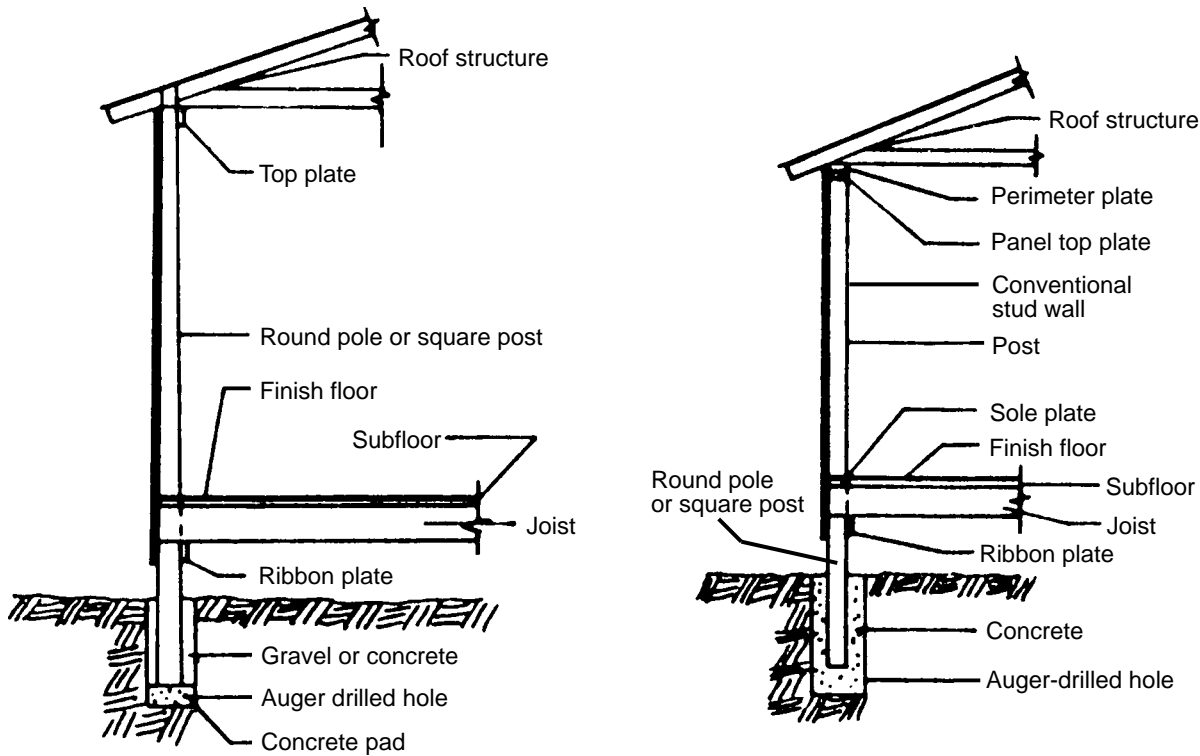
Pole and post-frame buildings: (left) pole or post forms both foundation and wall; (right) pole or post forms only the foundation for conventional platform-framed structure.
